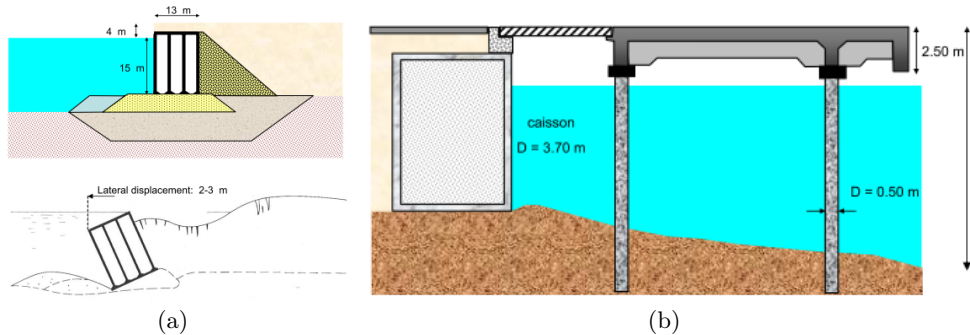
Cross sections of the severely damaged quay walls in Kobe earthquake, original from Giannakou [9]
